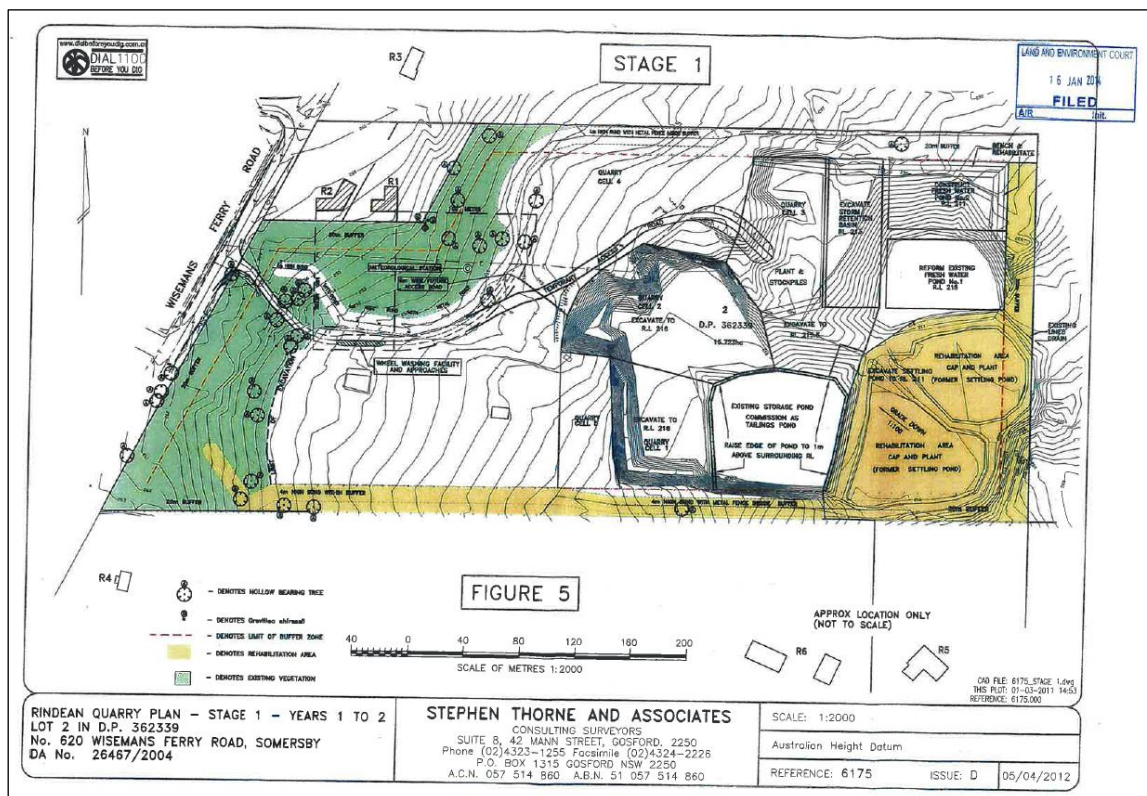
Site Plan 6175 Issue D showing location of southern noise bund
